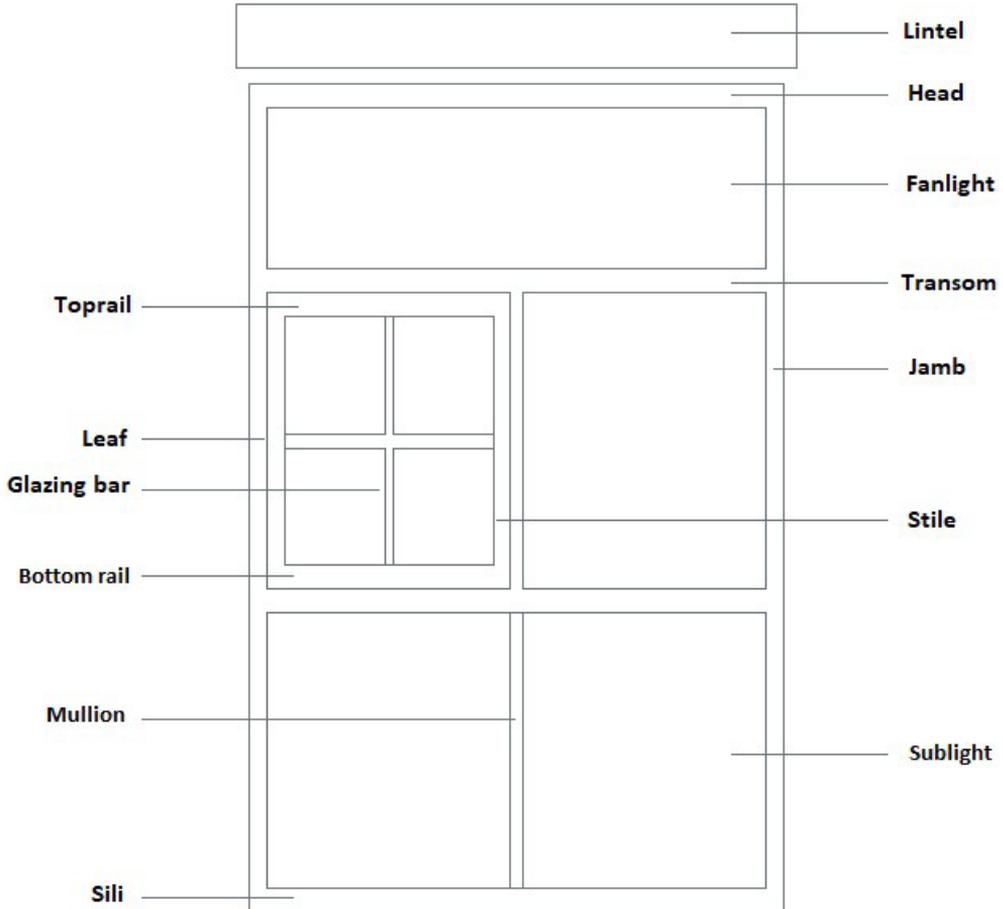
Window construction elements, from the top: lintel, head, fanlight, top rail, transom, jamb, leaf, glazing bar, stile, bottom rail, mullion, sublight, sili
